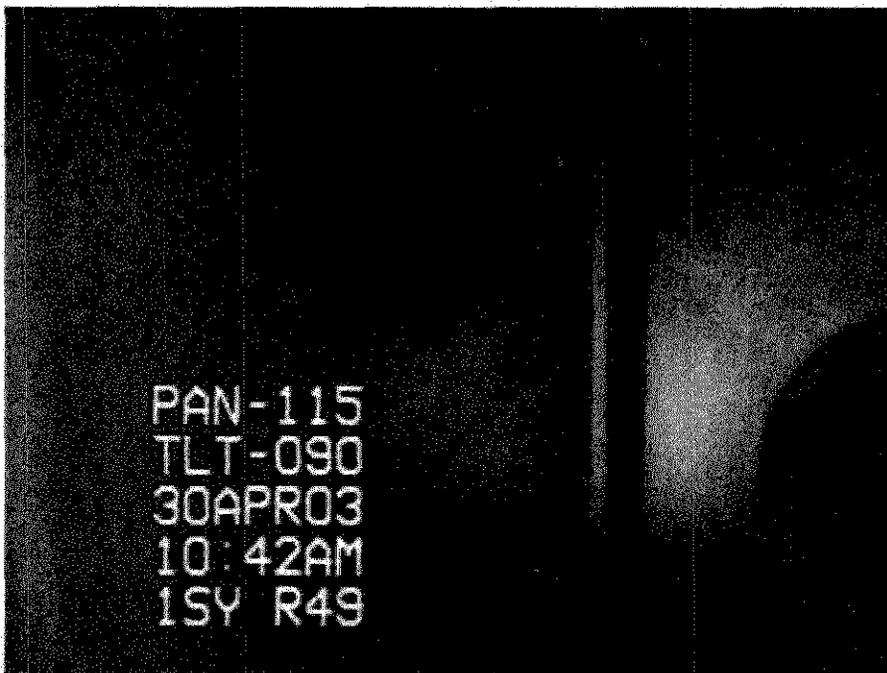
SY-101 Riser 49, Secondary Tank Wall (Left, 2003)
